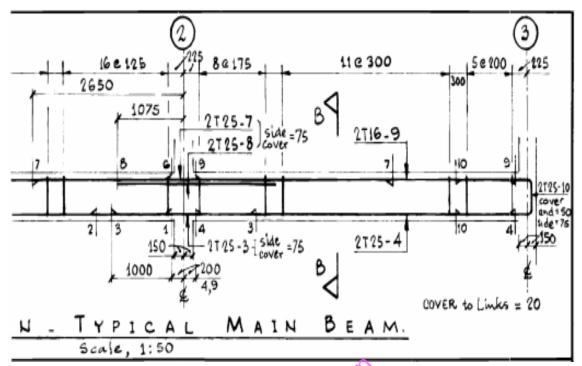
Detailed plan of a two-way spanning flanged beam Source: Higgins, J.B. and Rogers, B.R., Designed and detailed (BS 8110: 1997), Crowthorne, British Cement Association, 1998.
